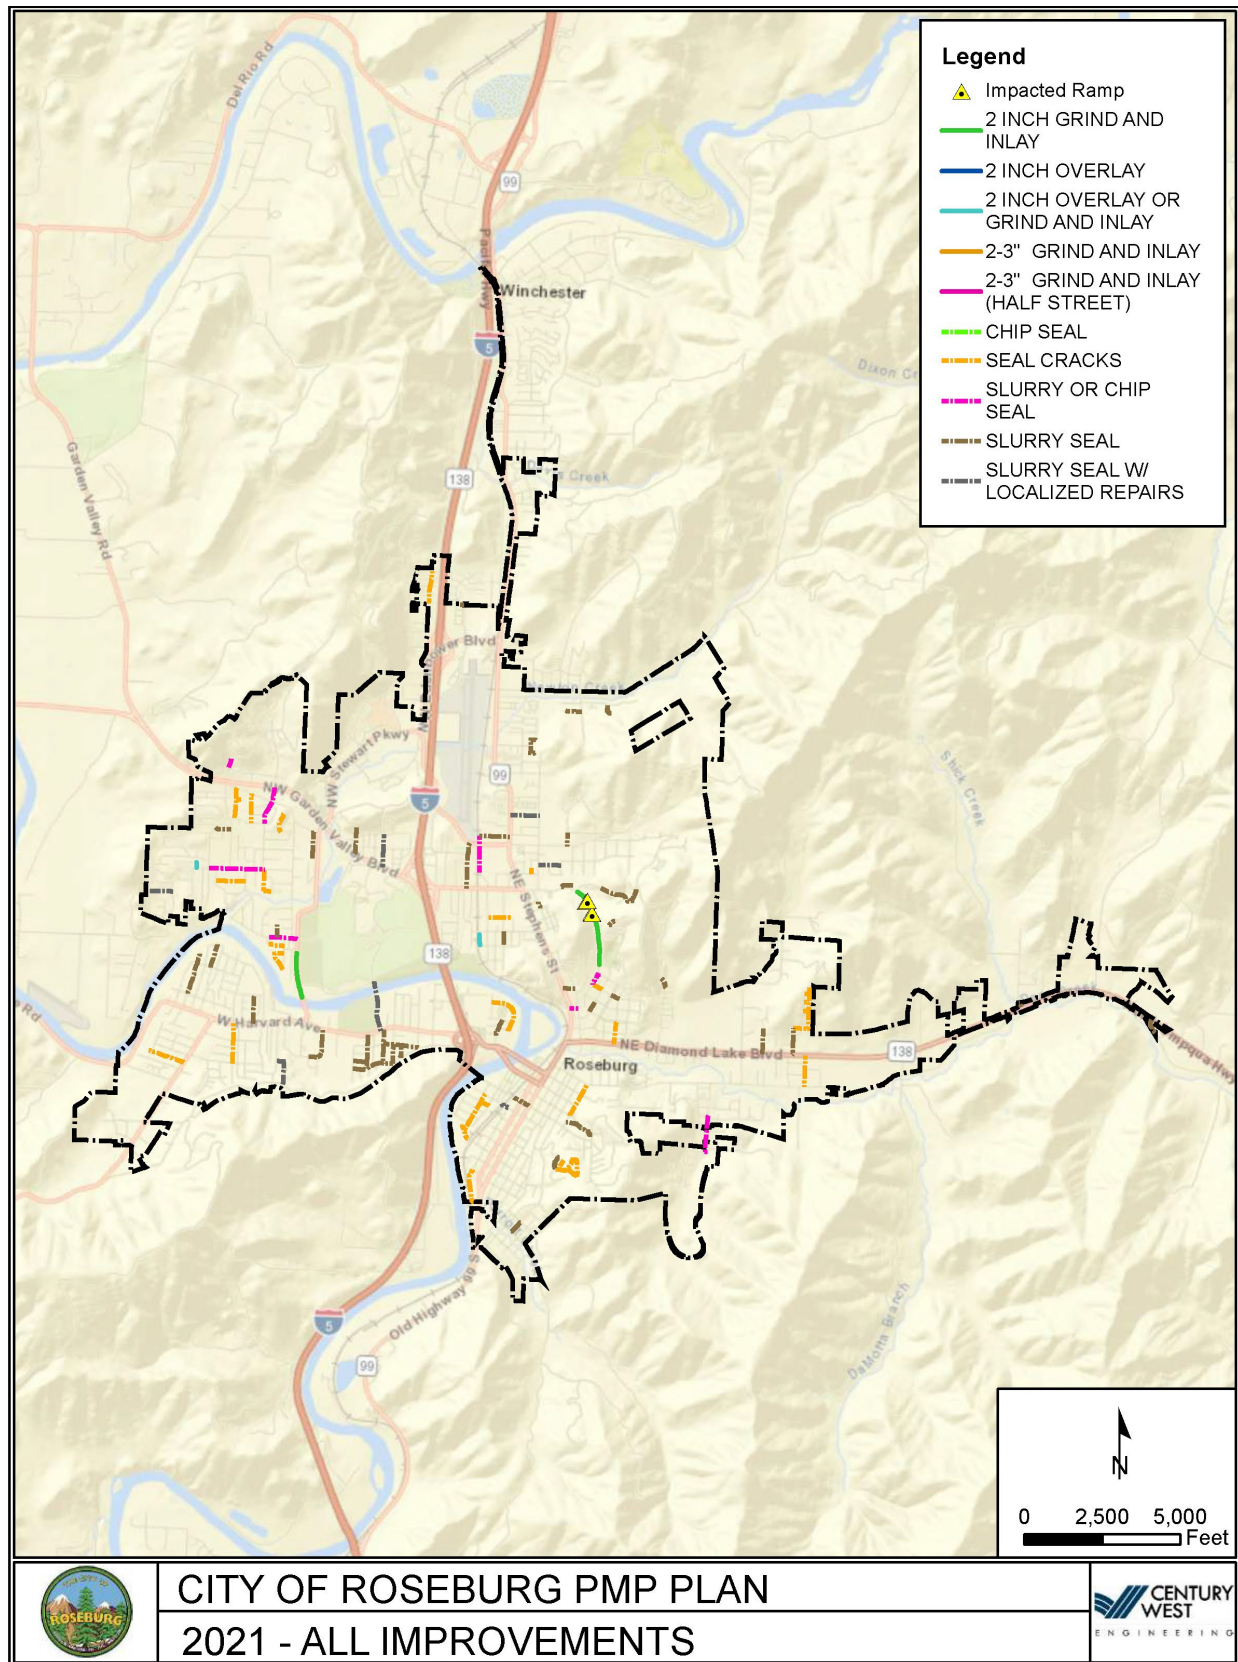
Five-Year Pavement Maintenance Plan: 2021
